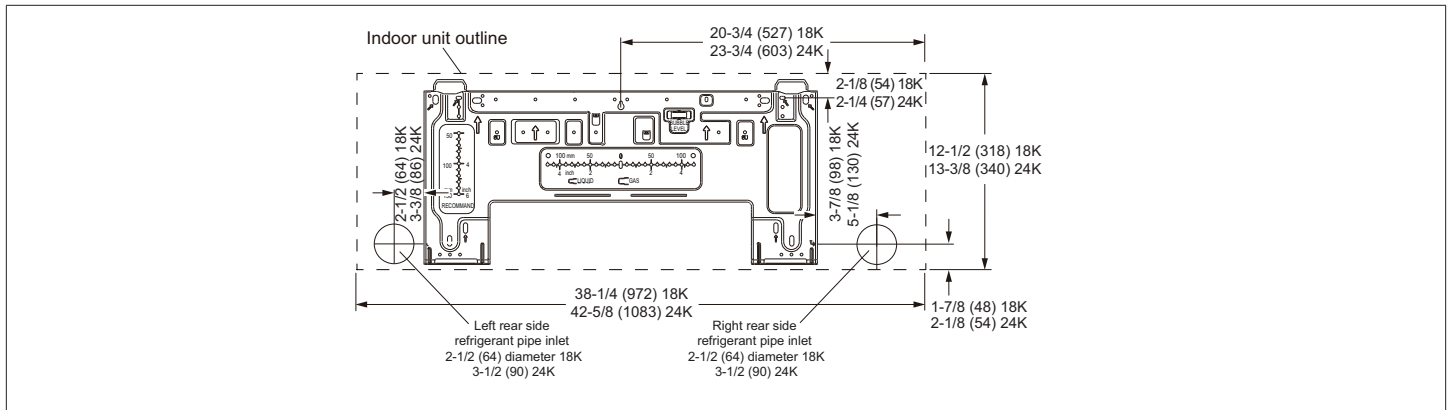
18K - 24K Indoor Unit Wall Plate Dimensions - Inches (mm)
